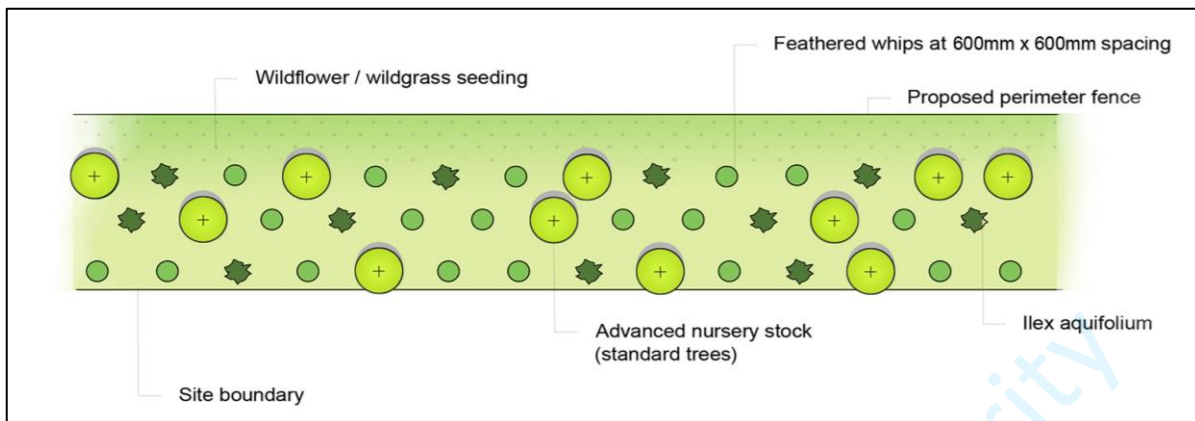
Hedgerow Type 1: indicative boundary planting detail showing the approach to inter-planting and under-planting of existing hedgerows (where consolidation is needed).
